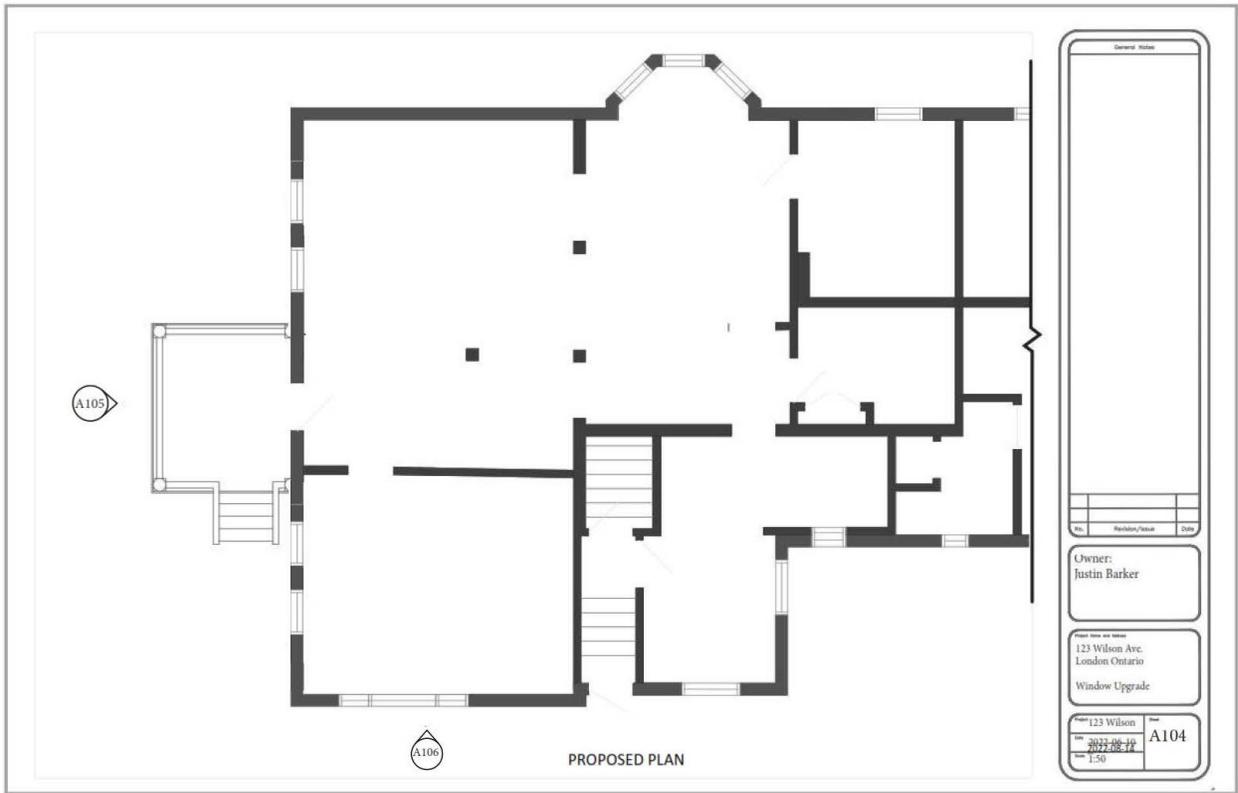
Proposed floor plan, submitted as part of the Heritage Alteration Permit application. Showing the proposed reinstatement of the four windows on the west façade as well as the existing window on the south façade.
